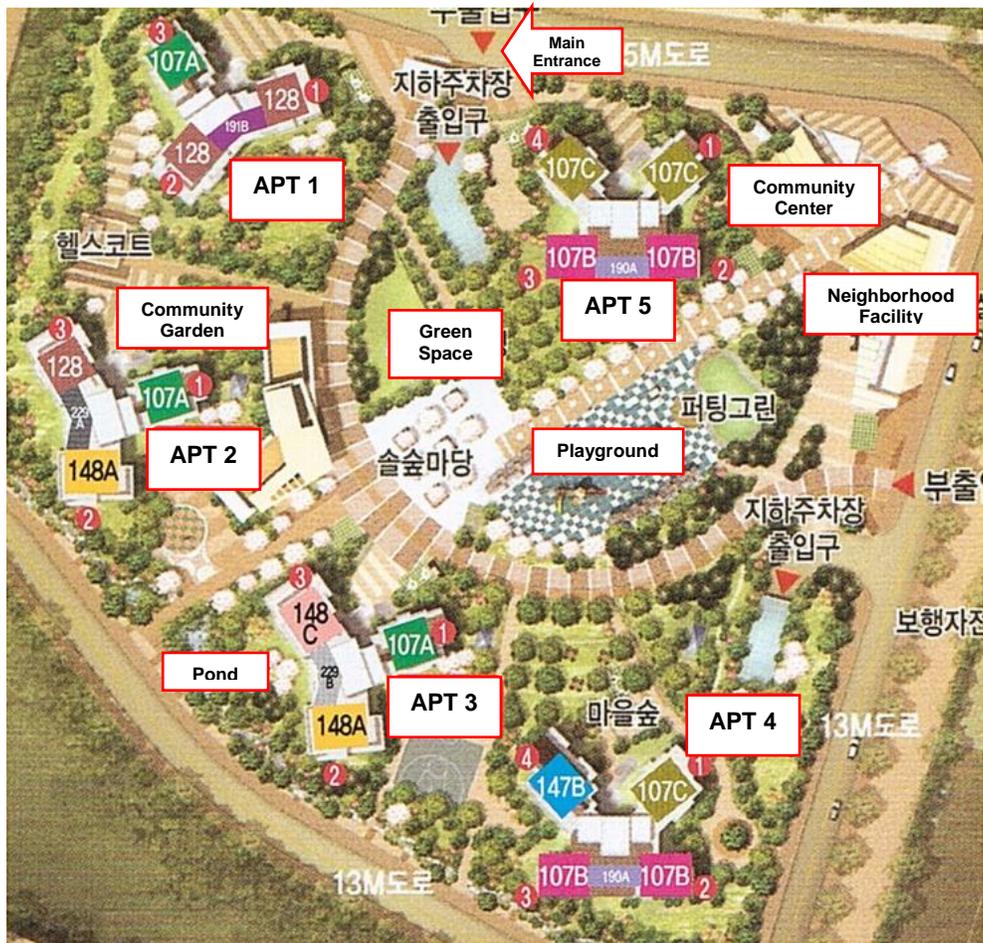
Site plan of Pangyo-won Village Community No.3. (Source: Budongsan 114, www.r114.co.kr).
